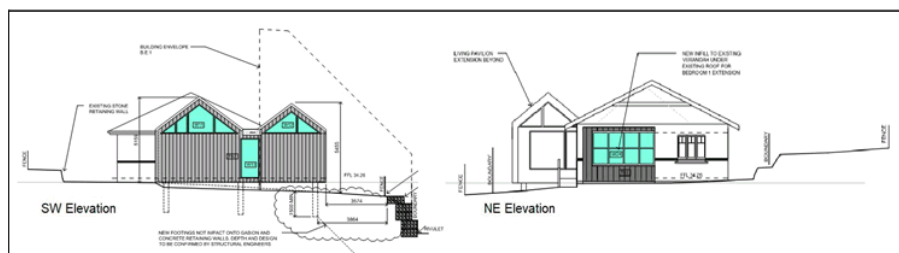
SW and NE Elevations (Eade Designs, 2020)
